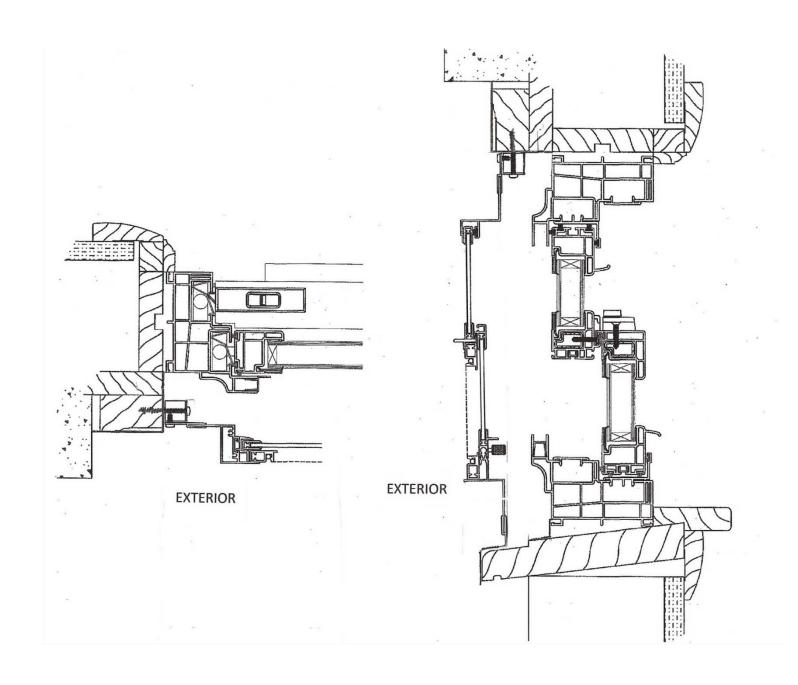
Exterior Acoustical Storm Window installed in Brick Veneer Wall
